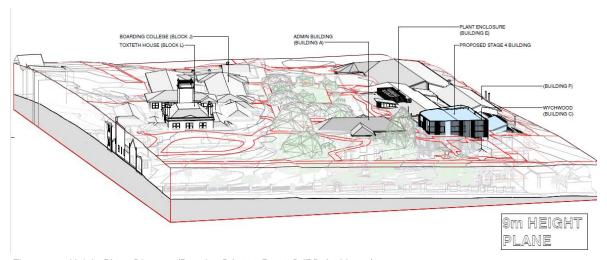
Height Plane Diagram (Drawing DA-923 Rev 2 DJRD Architects)
